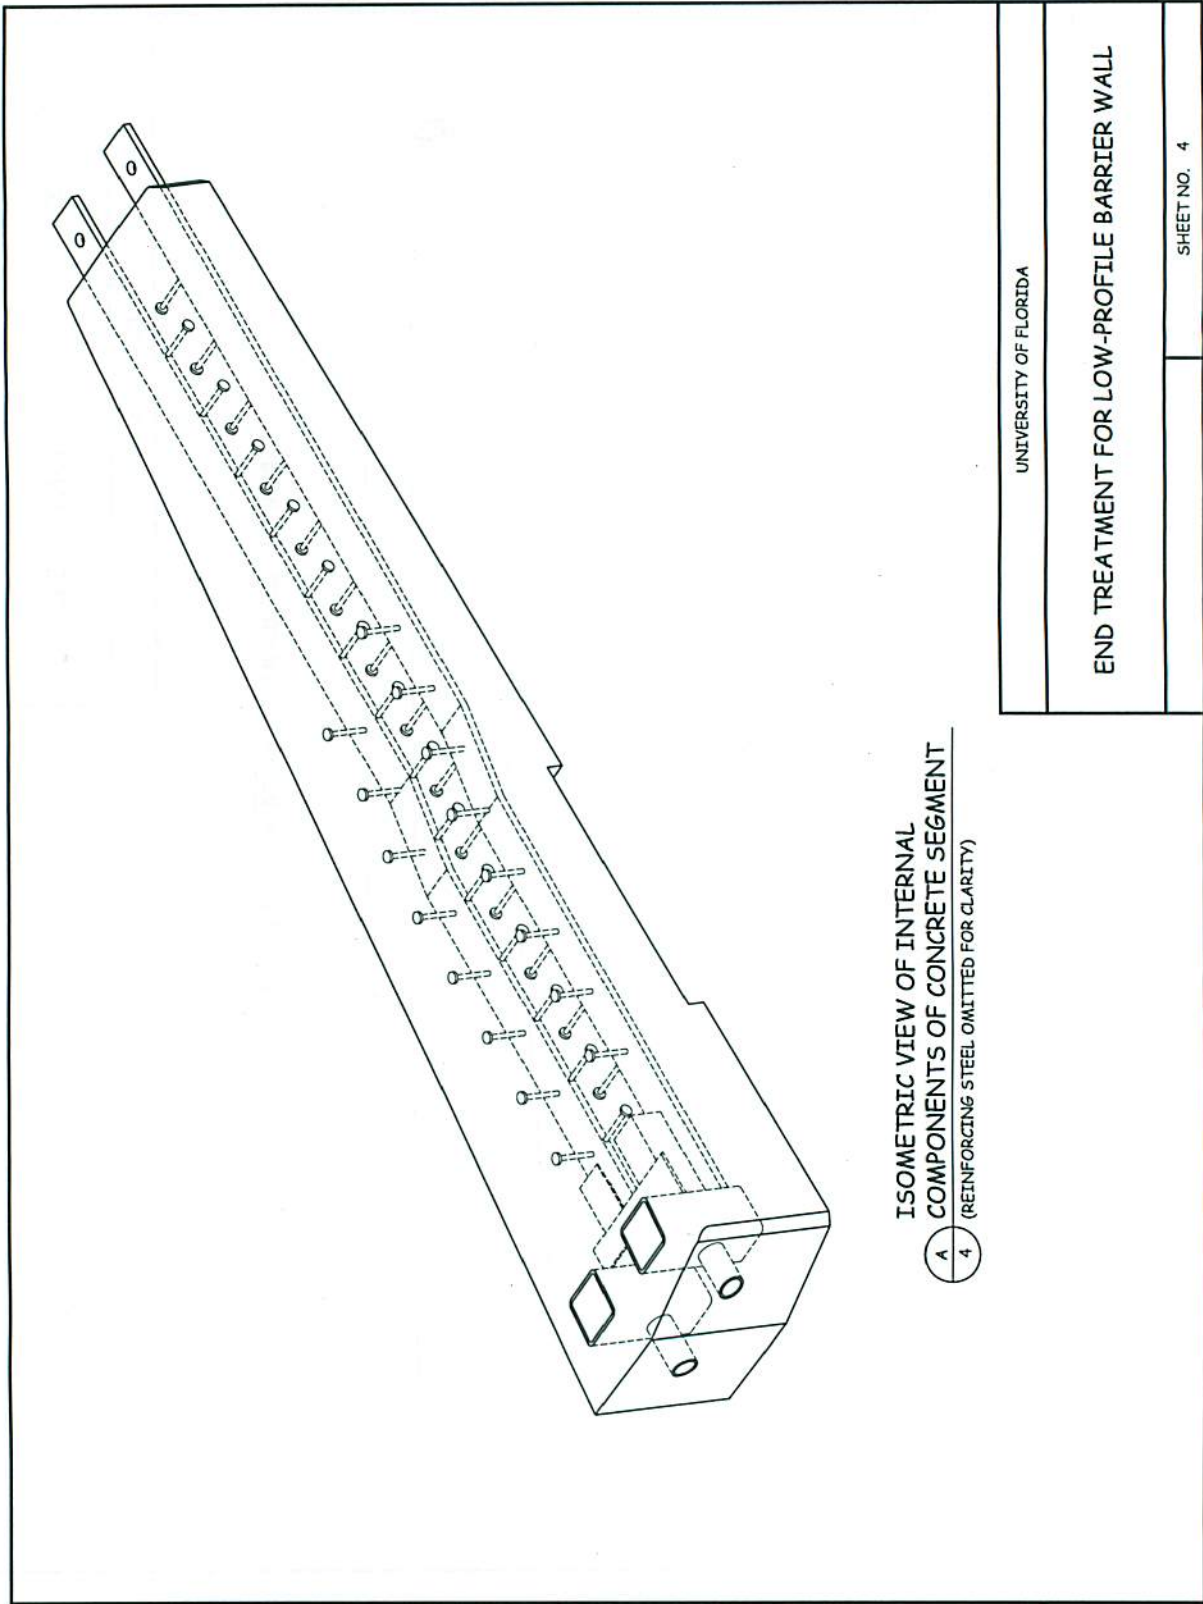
Drawings of Florida Concrete Curb End Treatment (7 of 14)
